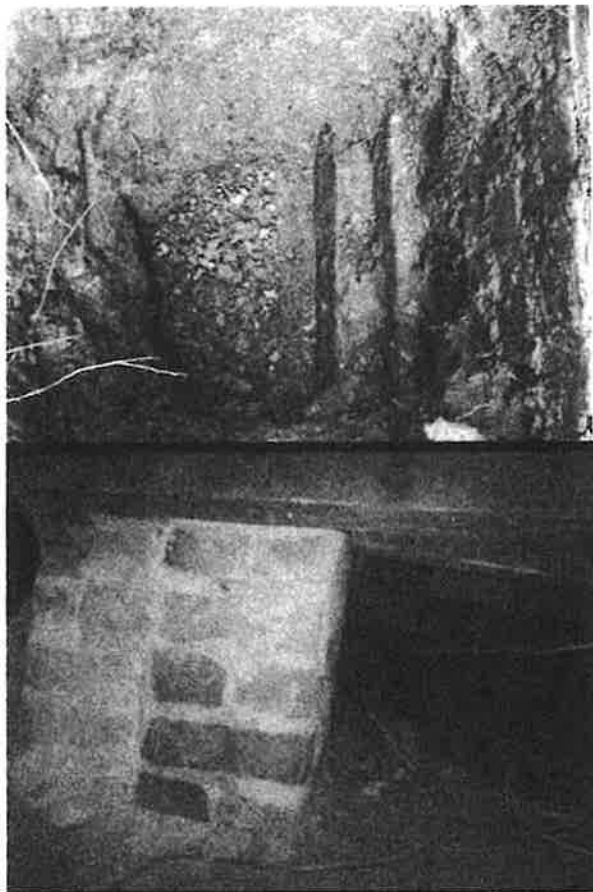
Corbelled foundation. These are all taken below the house. The 2x10's are almost 2x11. The foundation wall is 3 courses thick around the perimeter, with another wall from front to back in the center of the house (photo 1). Pillars are 18x18. There are also (4) 4 brick by 4 brick thick pillars between the foundation walls & the center wall floor.
